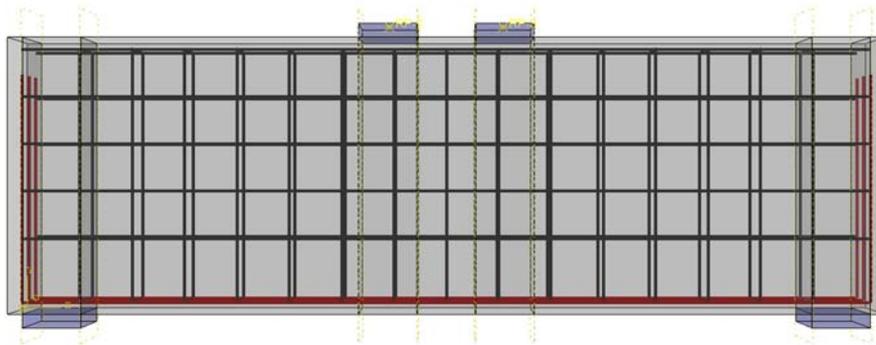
Re-modelling deep concrete beam B1 (DP-S1)
